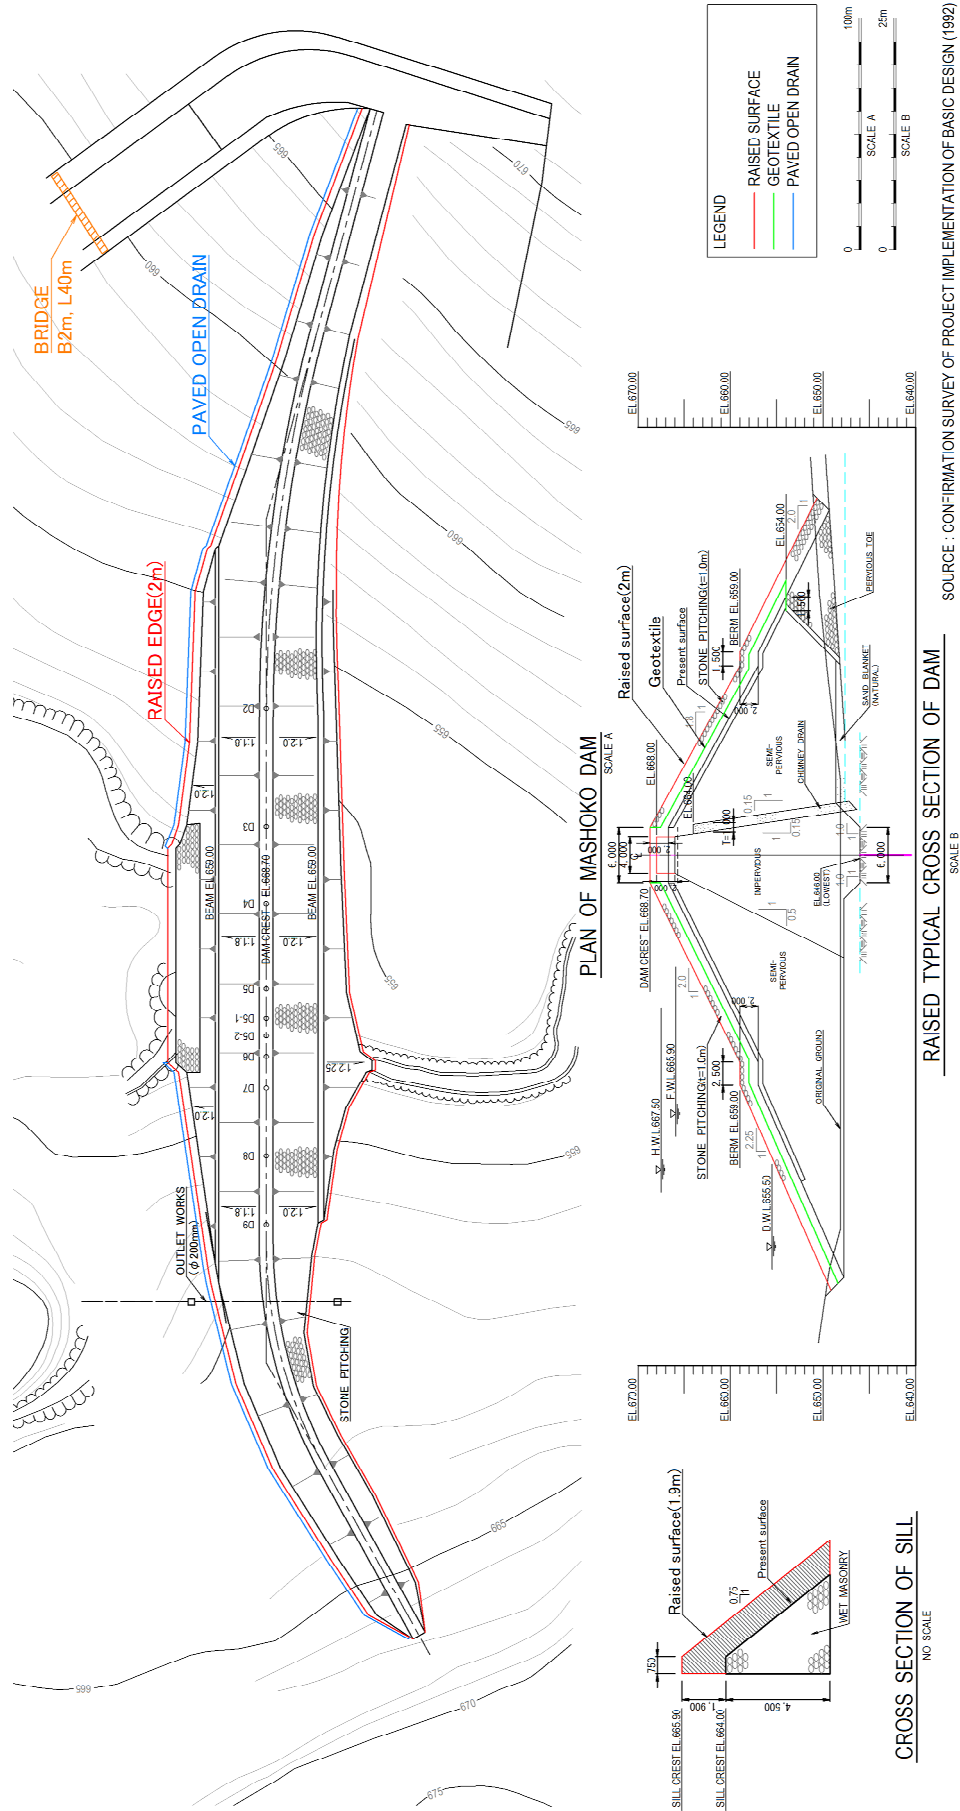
The Typical Cross-Section and Plan of the Raised Dam (Mashoko Dam)
